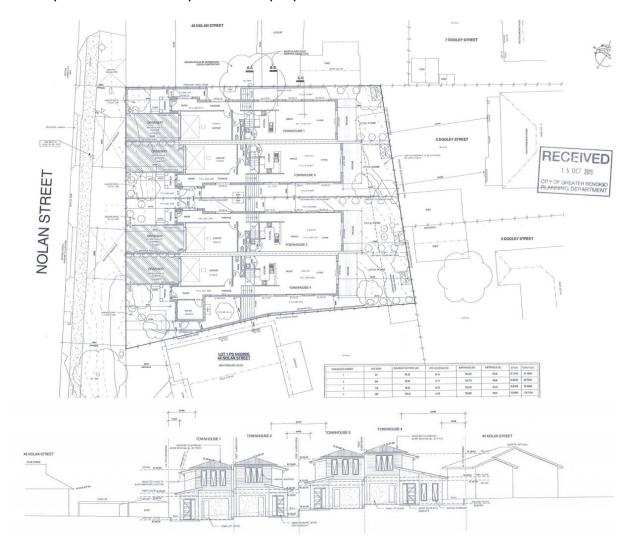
Site plan and elevation plan for refused application DSD/840/2013
